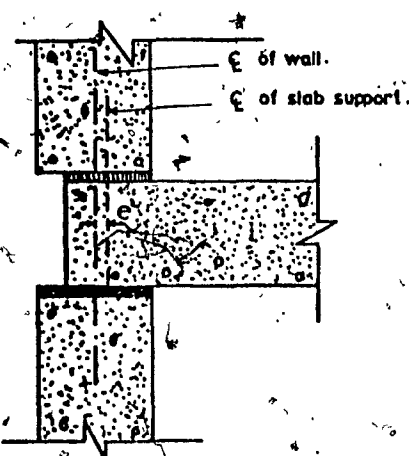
Horizontal Forces Parallel to the Plane of the Precast Concrete Wall Element and Along With Vertical Axial Forces
